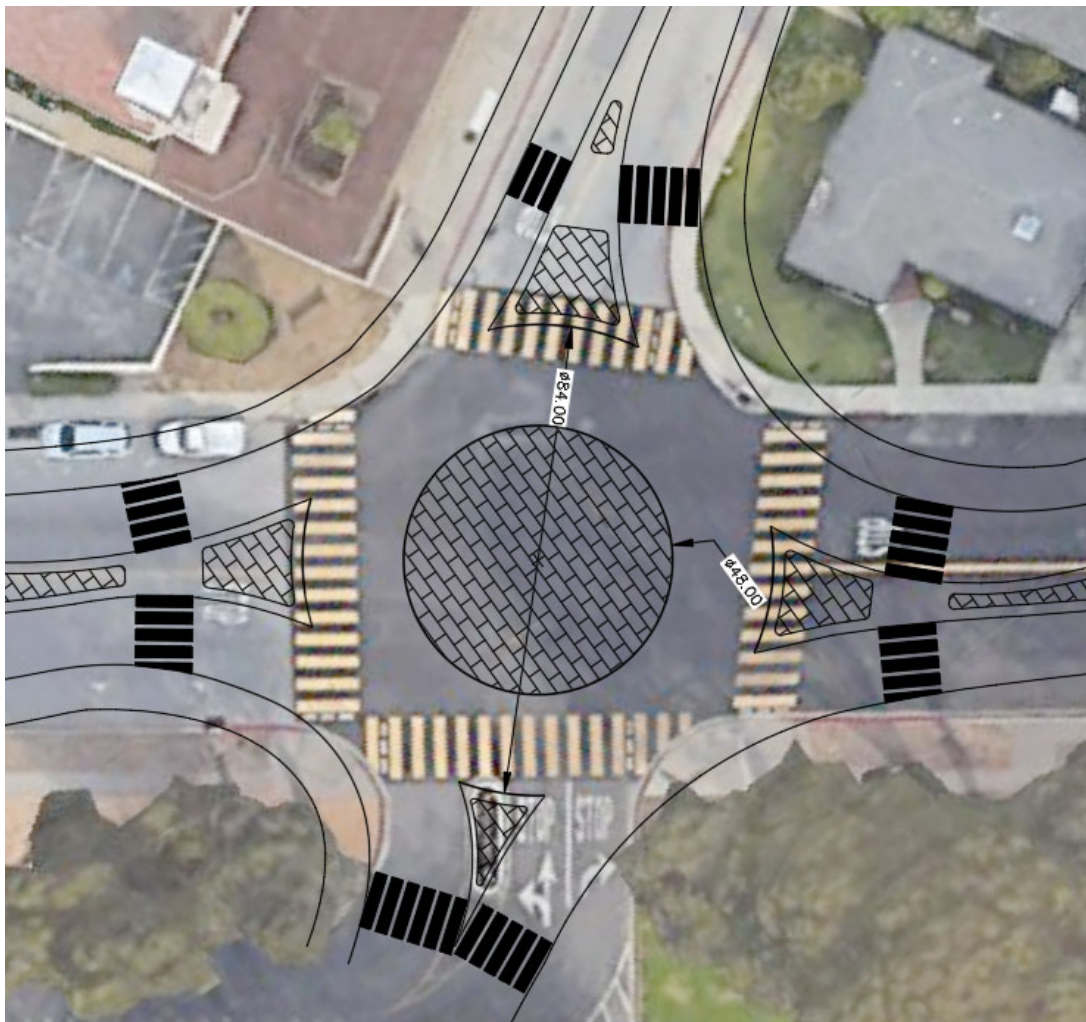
CRYSTAL SPRING ROAD/OAK AVENUE/CITY SINGLE-LANE ROUNDABOUT CONCEPT PLAN
